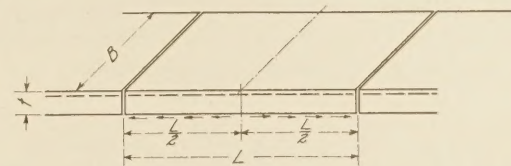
Diagram illustrating theory of crack spacing in reinforced concrete pavements
